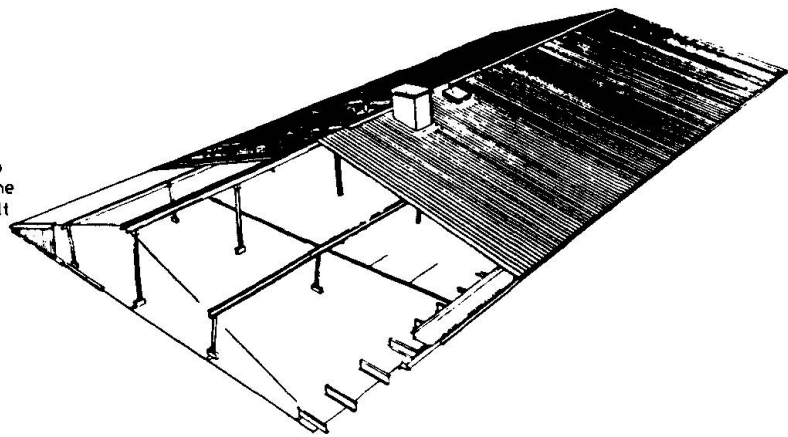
New strutted outer roof of metal sheeting with a 14° pitch. The roof was additionally insulated with 120 mm of mineral wool. The original internal drainage was closed off. The new roof was provided at the eaves with guttering connected to the storm-water drainage system.
